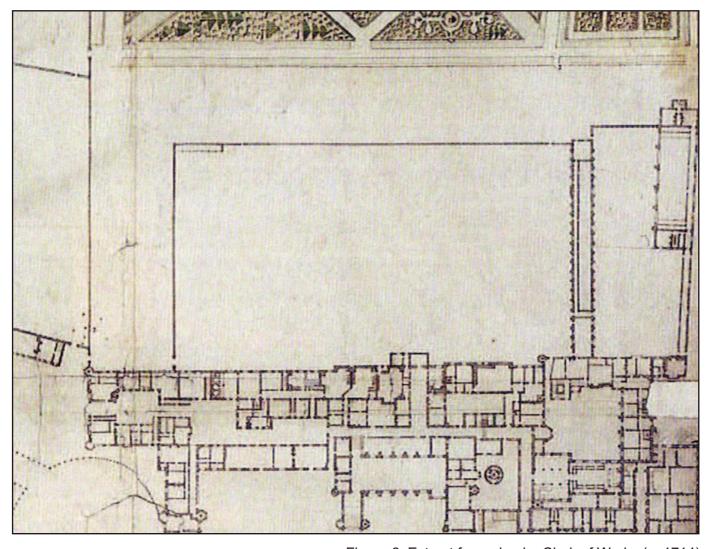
Extract from plan by Clerk of Works (c. 1714)
